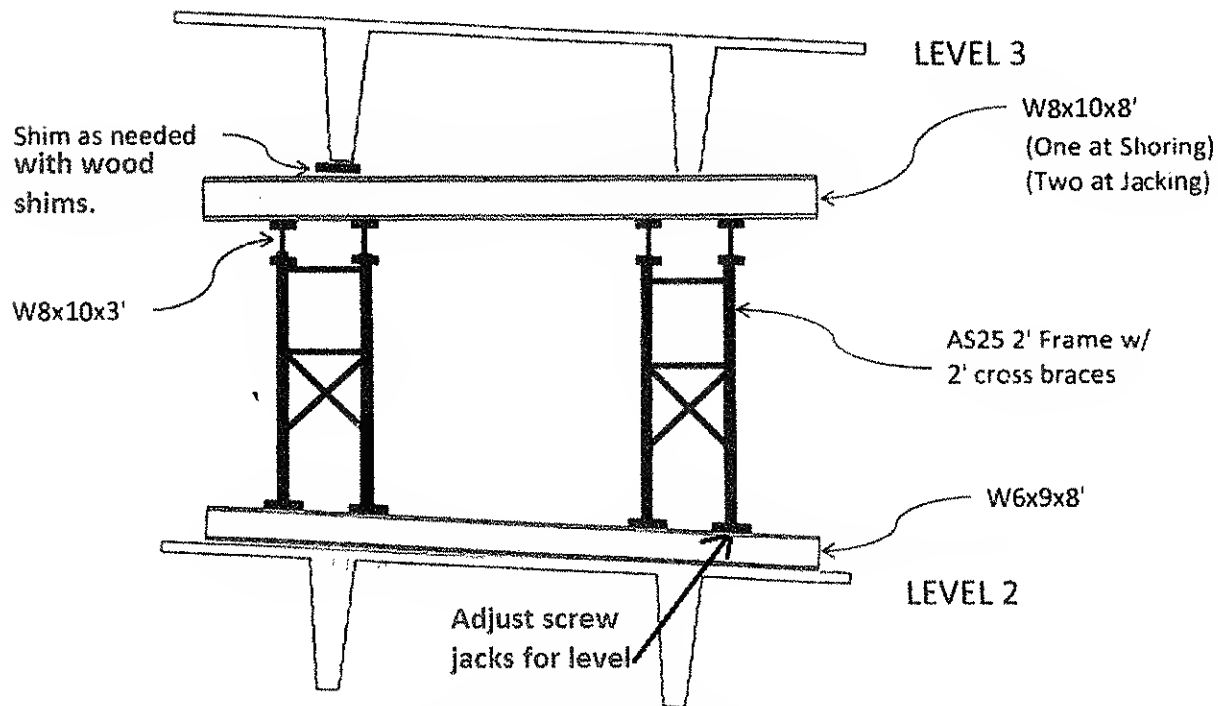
WT Drawing Sheet J3 dated 05-05-13: Section of Safety Tower Configuration
